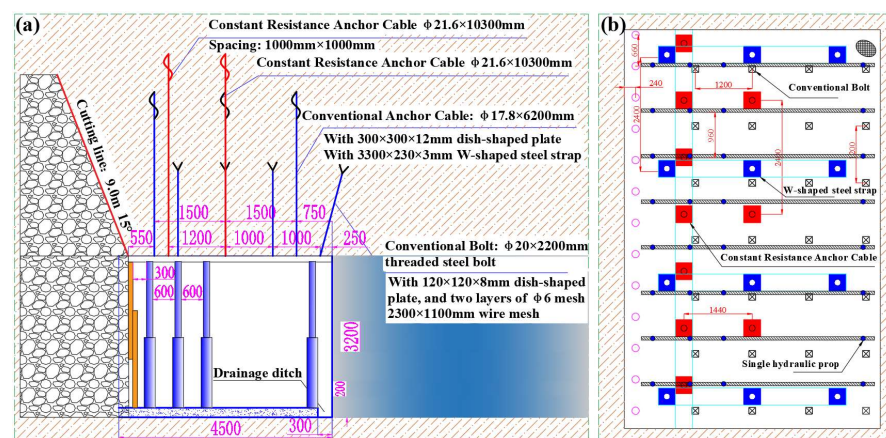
Temporary support for roadway retention along goaf (single pillar): (a) cross-section; (b) plan view.
